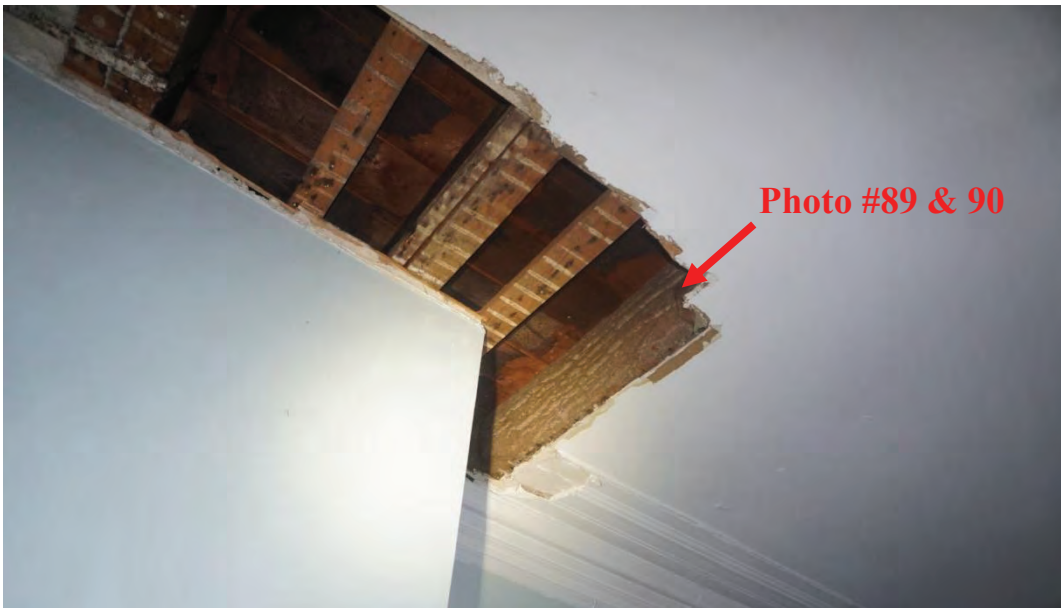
Ceiling joist that was never fully scored into a square framing member and still has bark exterior (Probe #4).
